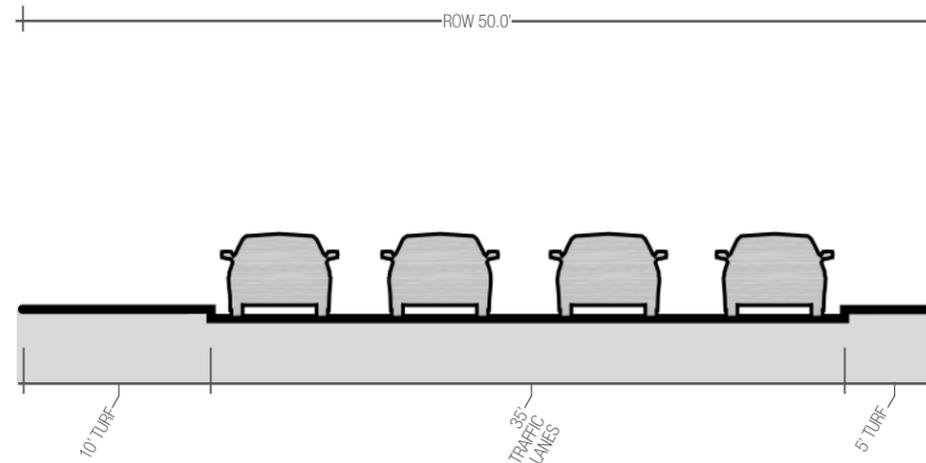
EXISTING 64TH TERRACE SECTION AND CONDITIONS
